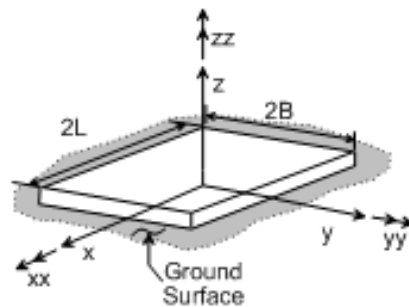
Sketch showing the geometry adapted for the rectangular foundation ($L \geq B$).
